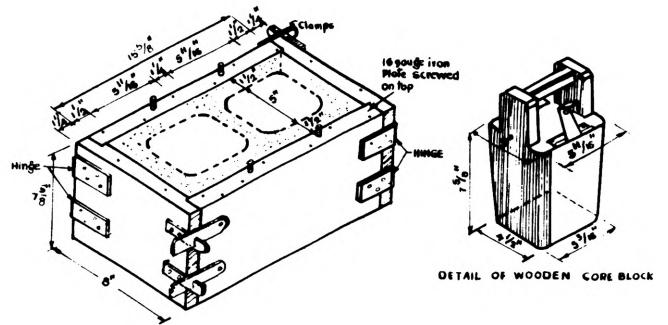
(a) WOODEN MOULD FOR MAKING ONE HOLLOW CONCRETE BLOCK AT A TIME.
